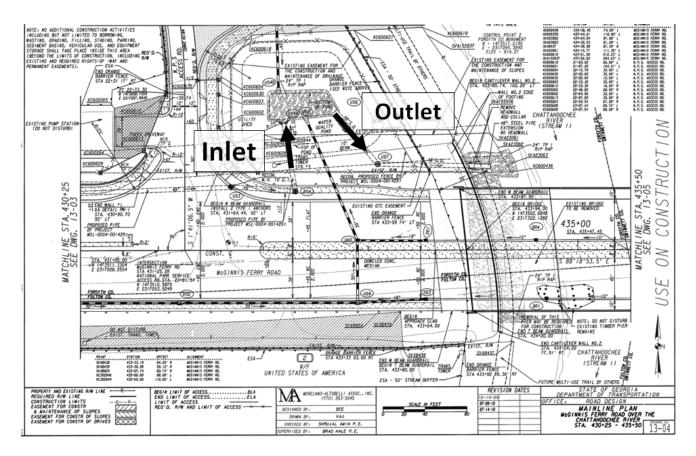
Site plans and sampling locations, McGinnis Ferry BMP, Suwanee, GA.
